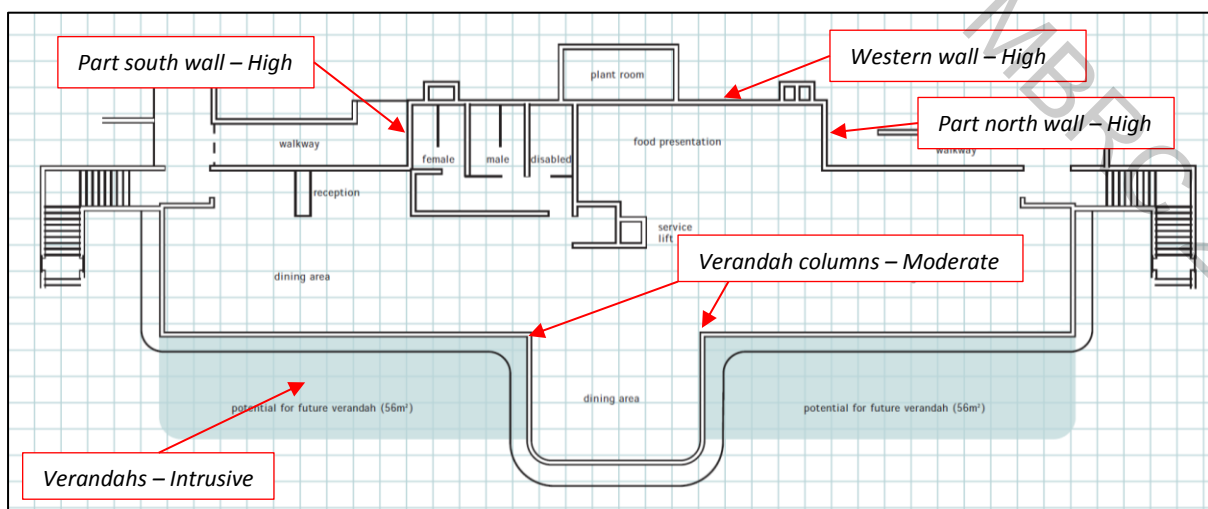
Location of significant elements at the second floor of the pavilion (MBRC 2006: 9).
